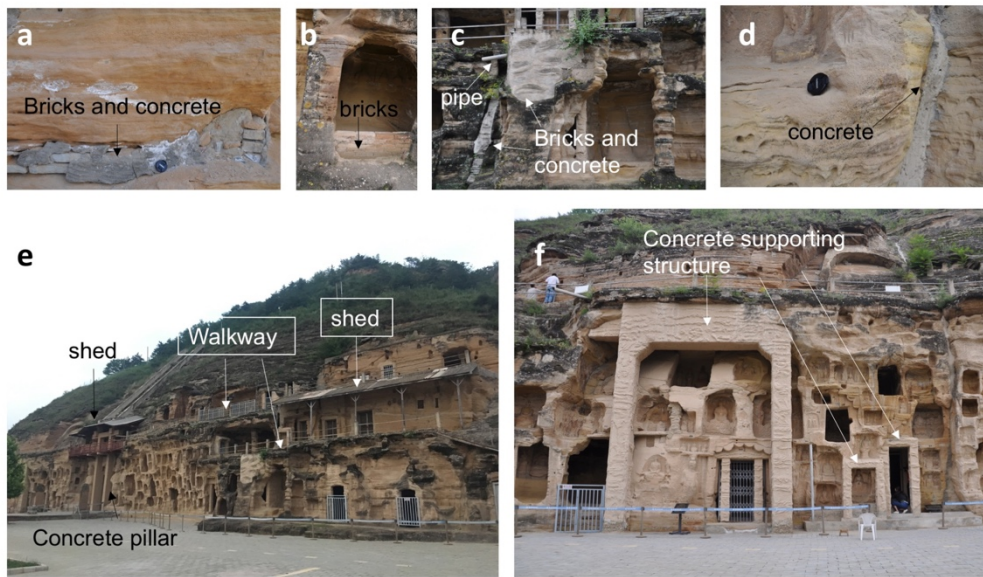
Examples of filled-fissures and added new supporting structures at NGT: a. bricks and concrete applied to fill the gap at bottom; b. brick-constructed doorstep; c. repaired part applied with concrete, filling fissures with bricks and concrete; d. filling fissure with concrete; e. sheds, walkway on the first floor and concrete pillar in front of 165 cave; f. concrete supporting structures.
